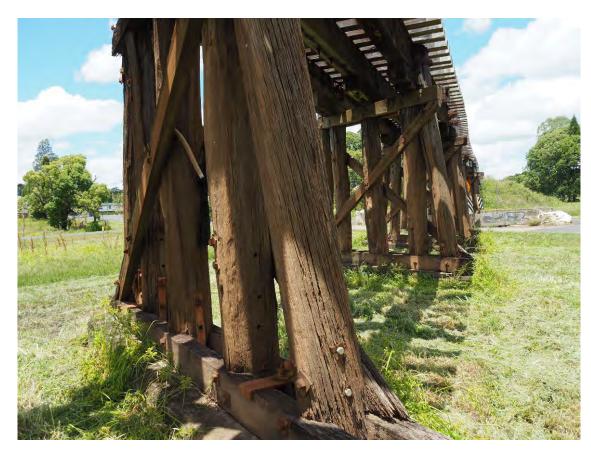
Terania Street - Splitting & weathering of piles at Pier 11 (Source: FBE)
